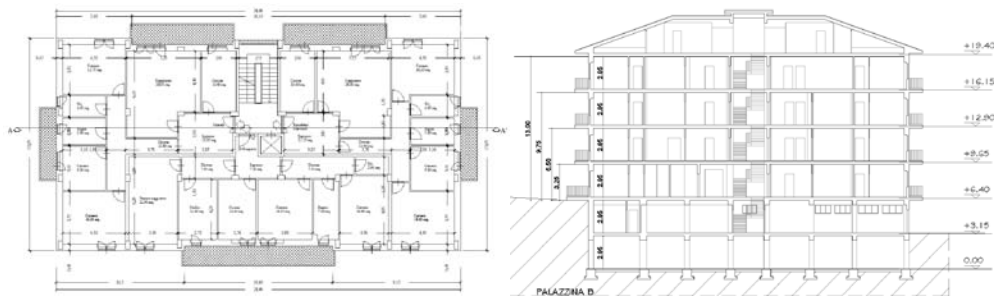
Plan of a typical floor and longitudinal section of the sample building.
